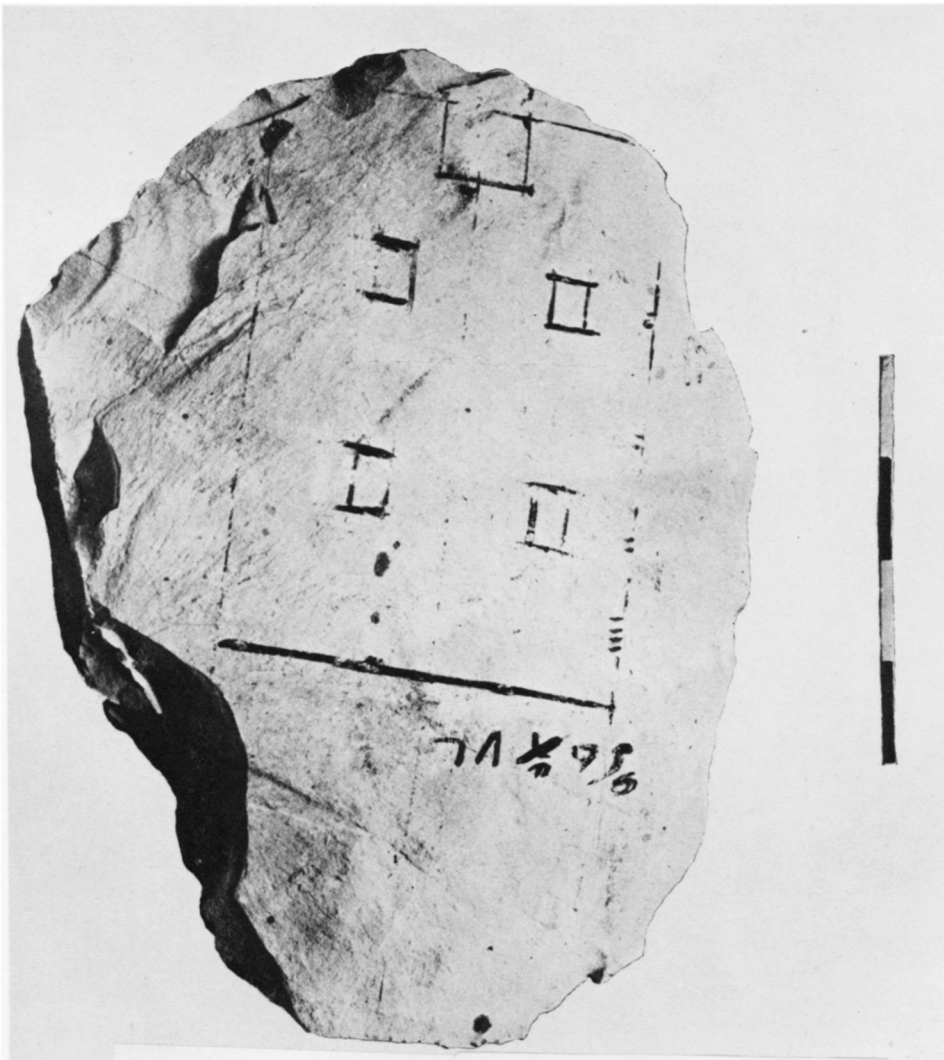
Architect's floor plan for a rectangular chamber (Cairo Museum of Antiquities).
